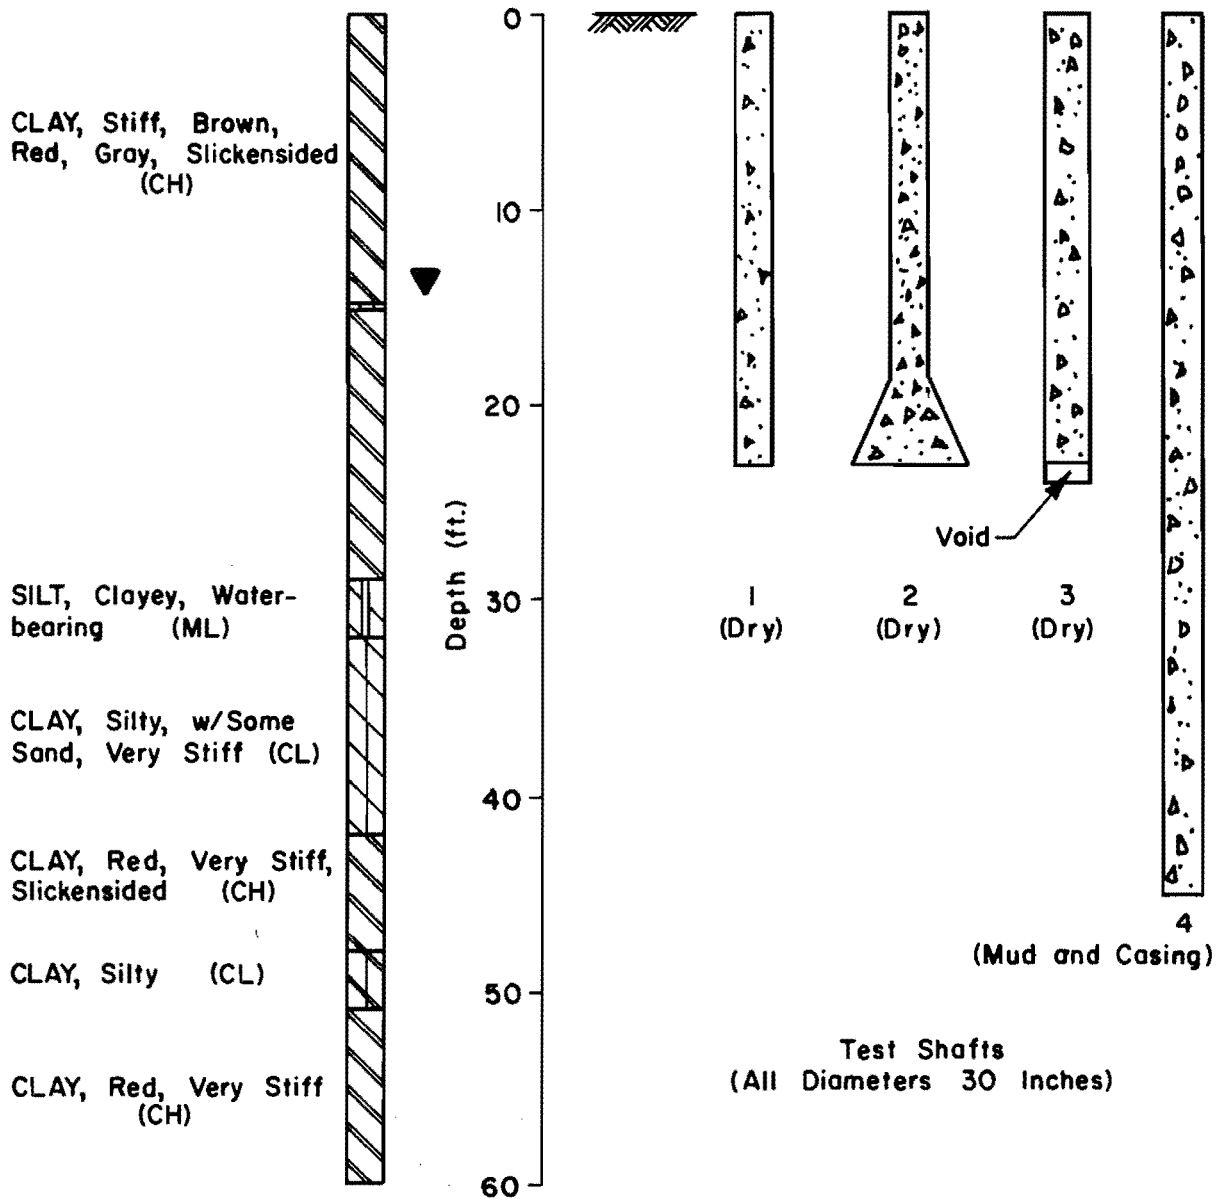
Profiles of soil composition and test shafts, 5H225 test site (Site III) (After O'Neill and Reese, 1970).
